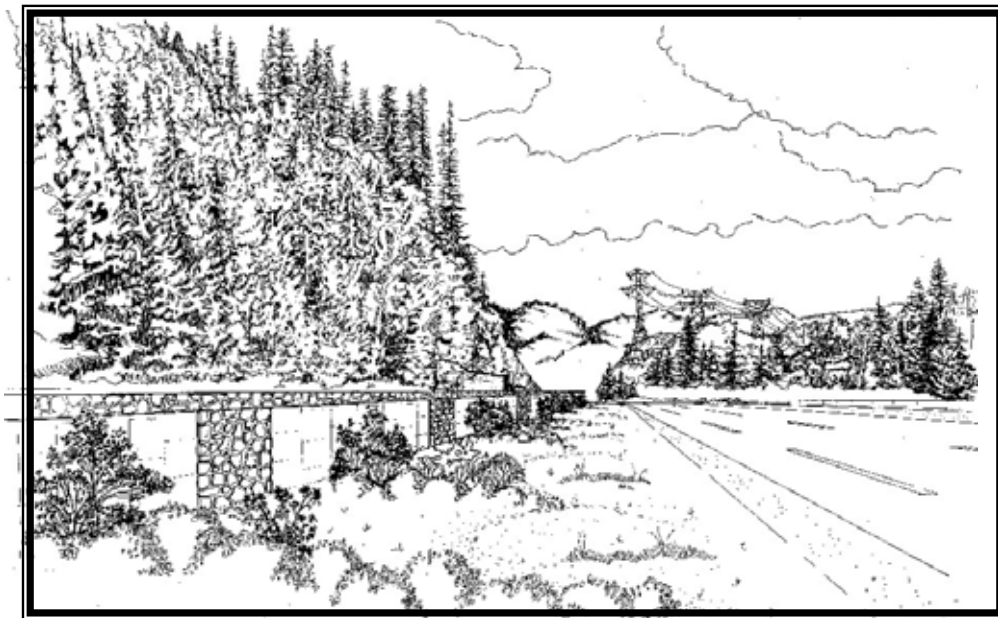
Concept for Retaining Walls after Project Completion & Plant Establishment
